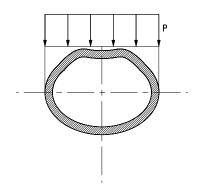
Ring Buckling of Pipe Cross Section
